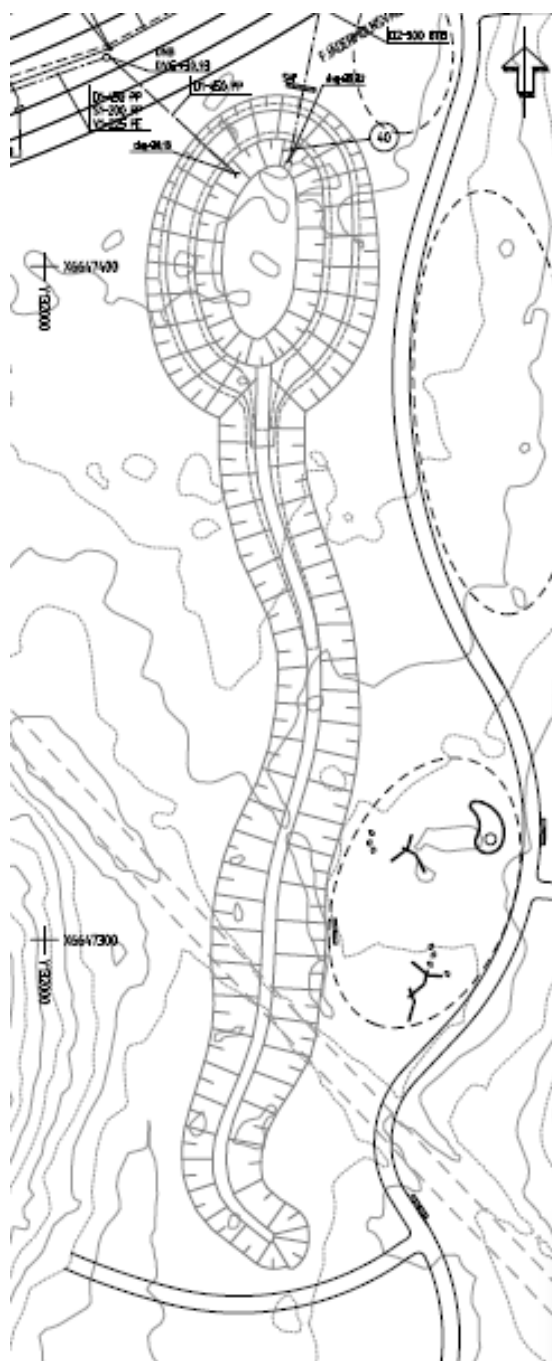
Floor plan. Fullerö southern pond. Extracted from drawing provided by Uppsala Vatten (Bjerking AB, 2017a).
